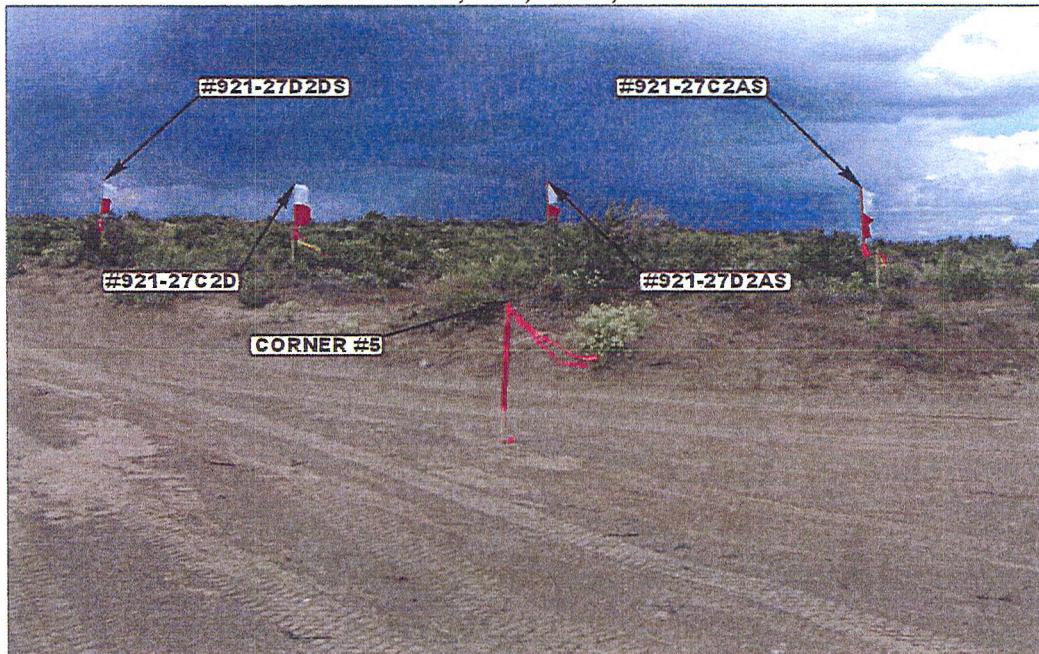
PHOTO: VIEW FROM CORNER #5 TO LOCATION STAKES
